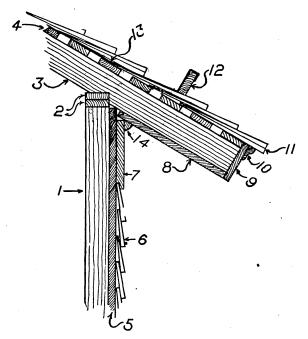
Construction of cornice: 1, studding; 2, plates; 3, rafter; 4, roof sheathing; 5, sheathing; 6, siding; 7, frieze; 8, planscia; 9, fascia; 10, crown mould; 11, shingles; 12, gutter; 13, tin gutter lining.
